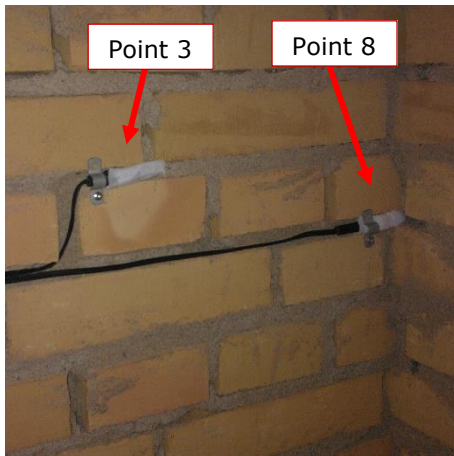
Sensor Point 3 and 8: Measurement point closest to the original interior surface of the masonry wall, sensing area facing mortar. Photo courtesy of Søren Peter Bjarløv.
